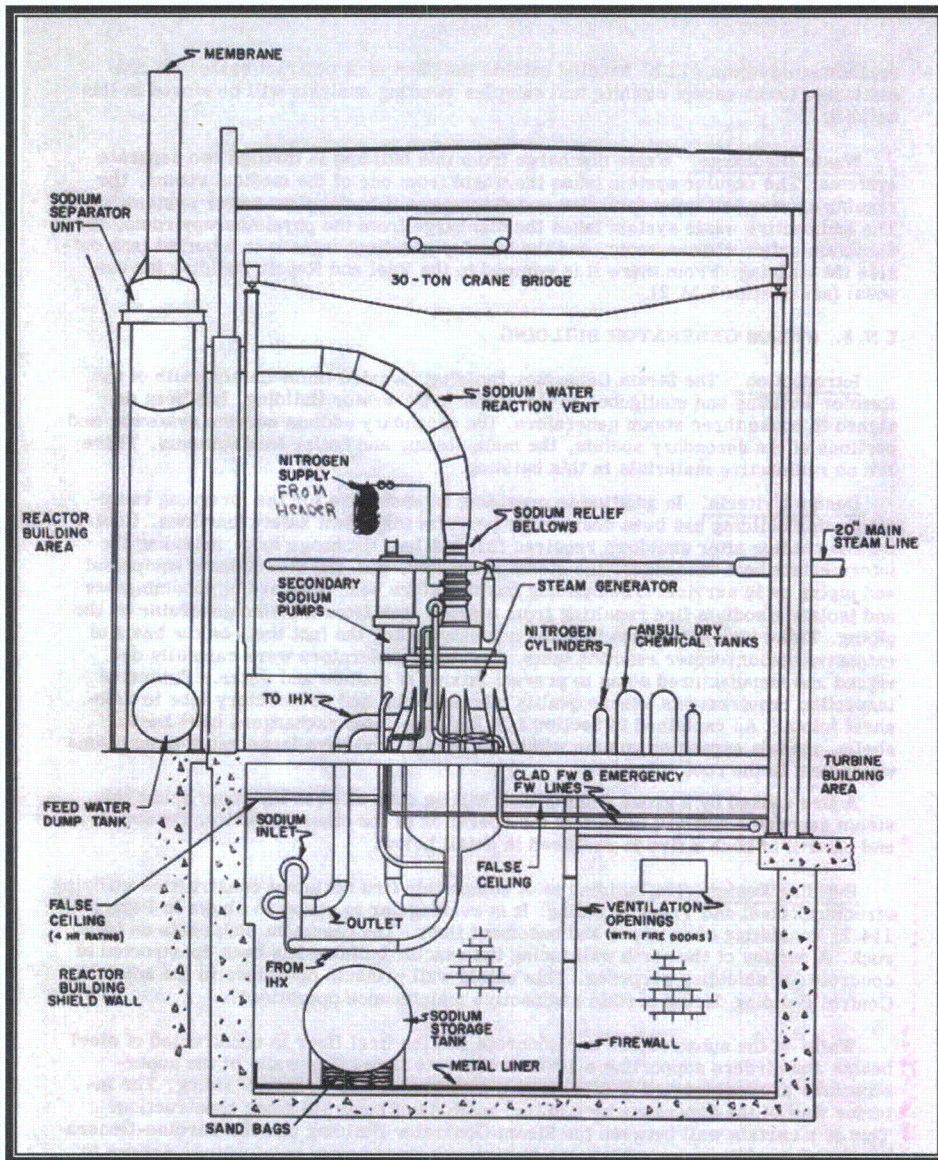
Transverse section of steam generator building (Courtesy DECo)
